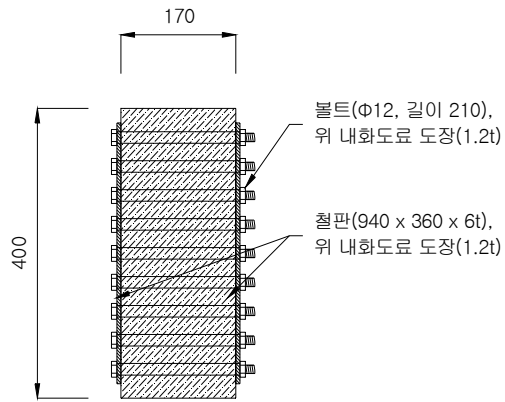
Configuration of glulam beam with bolted steel gusset plate joint at center.
